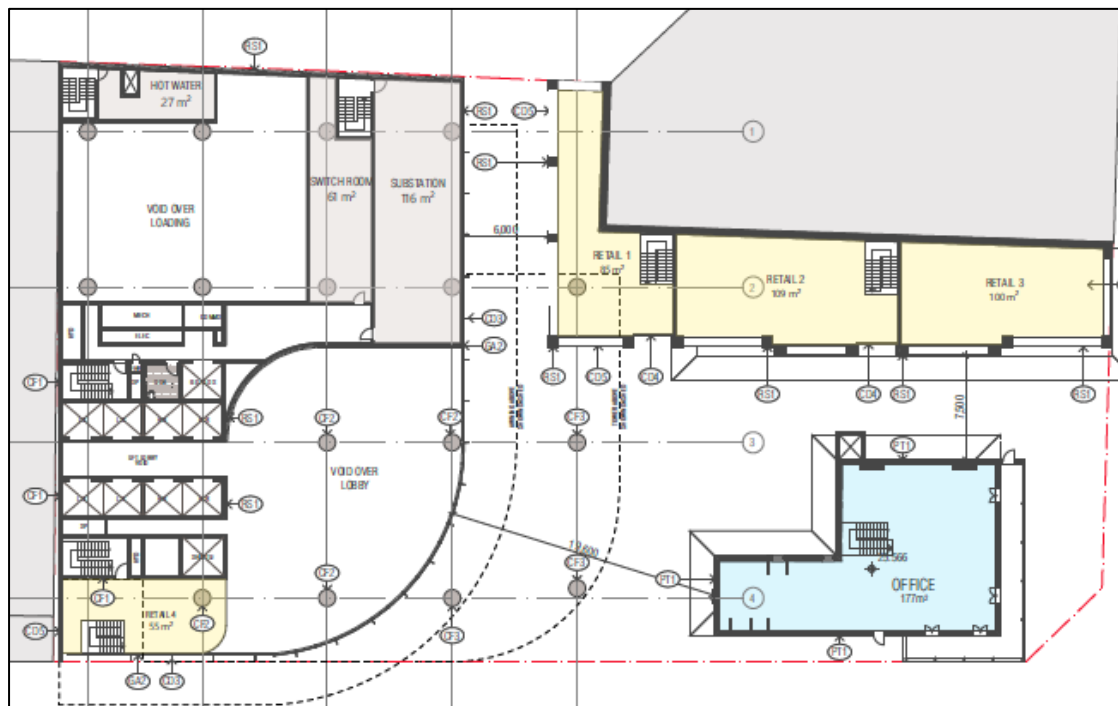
Proposed Level One (Back of House) Plan (FK Architects, 2018)
